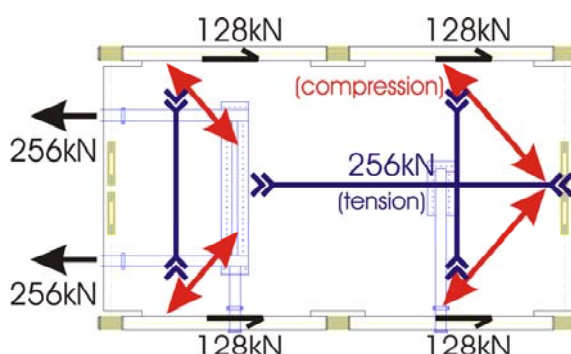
Slab reinforcing mesh design forces (floor plan)
